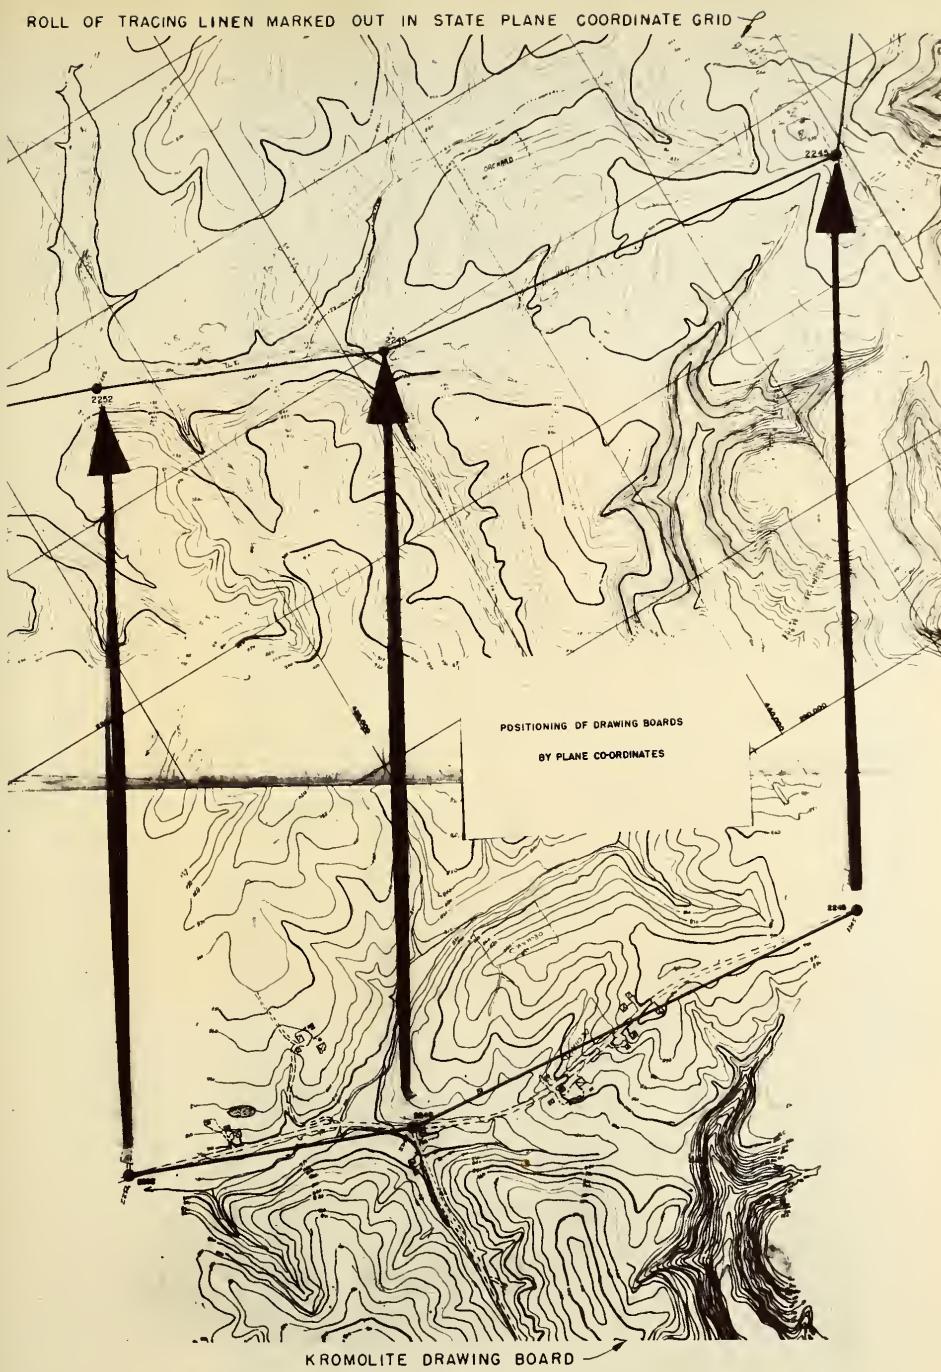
POSITIONING DRAWING BOARDS FOR TRACING
